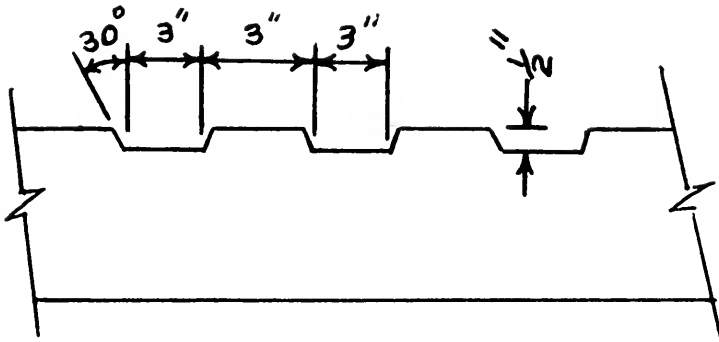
Castellated daps in all laminations of the West Coast Lumbermen's Association modified composite deck slab.
